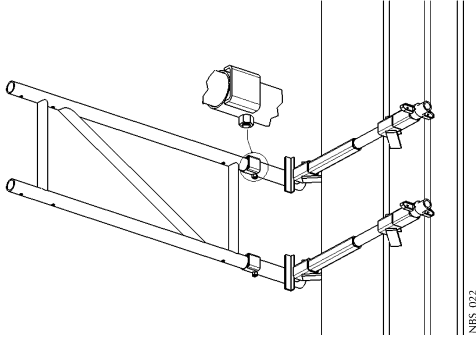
Mounting of Truss Beam on Steel Jaw Clamps
